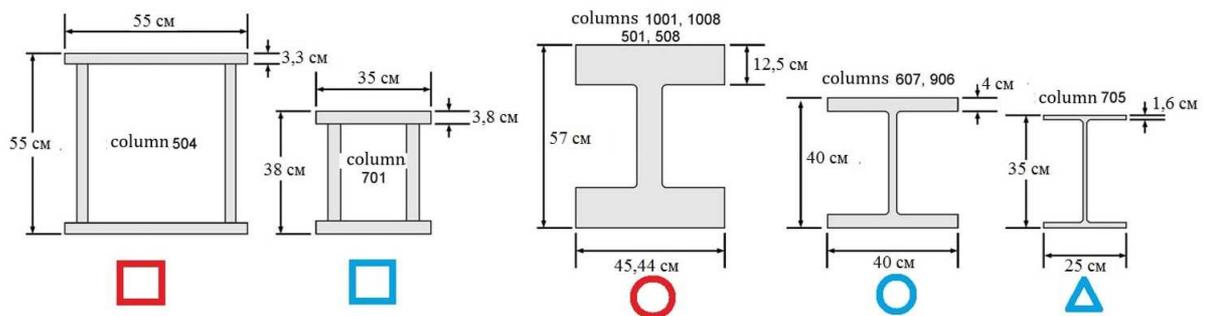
Typical welded box elements and rolled wide shelves used for the main columns between the 83rd and 86th floors (in scale)
